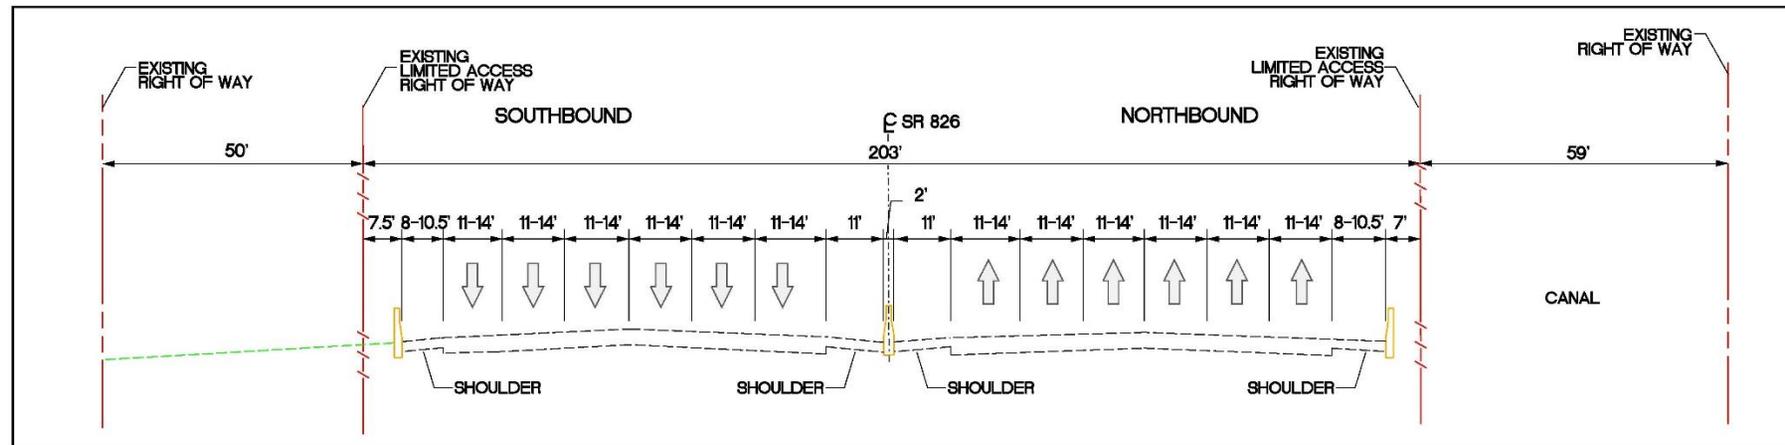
2: Existing Roadway Typical Section between SR 874 and SR 836
